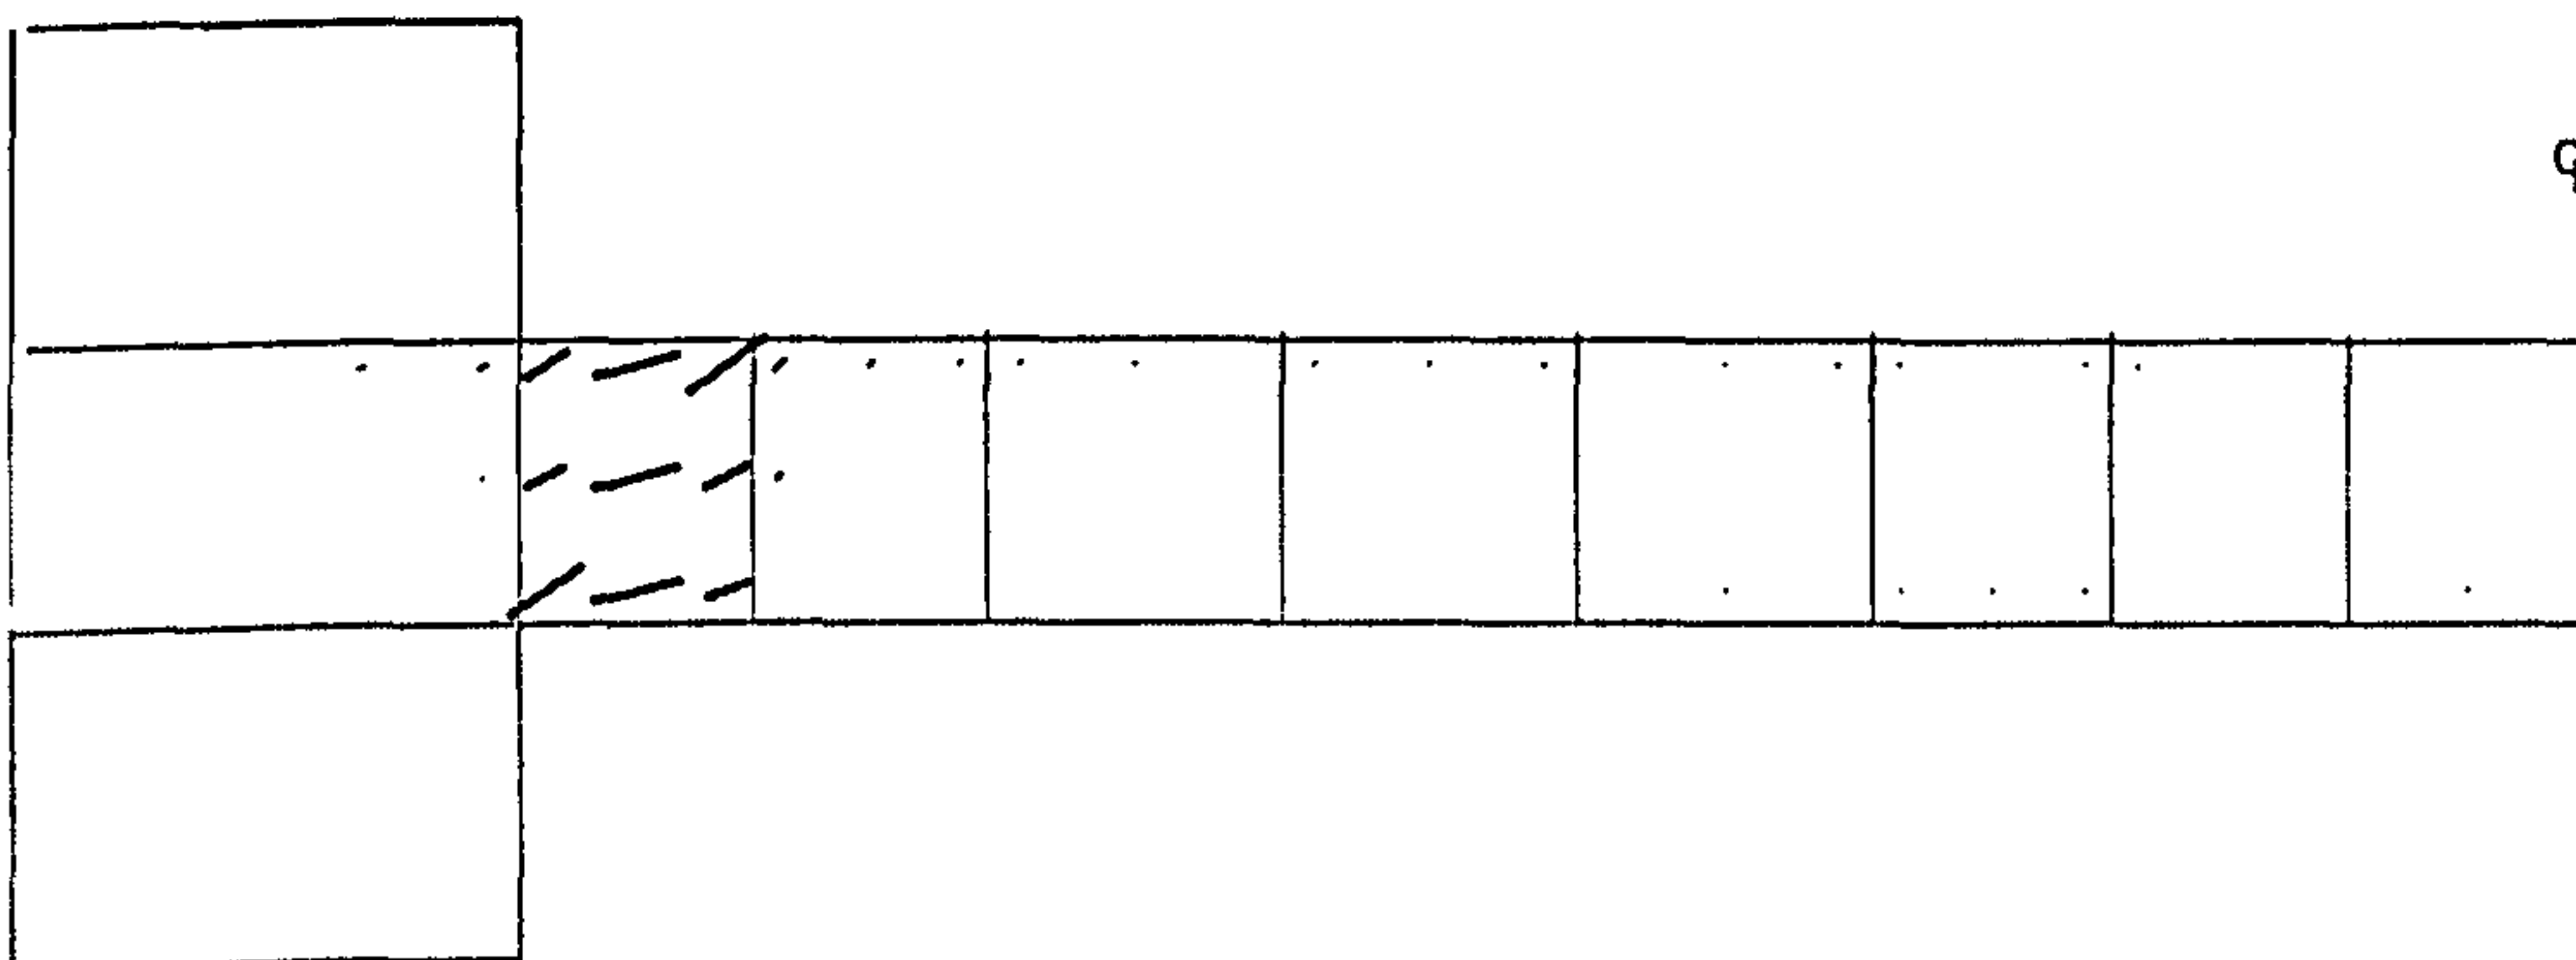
Crack pattern in elevation of slab (SE4), shear failure
